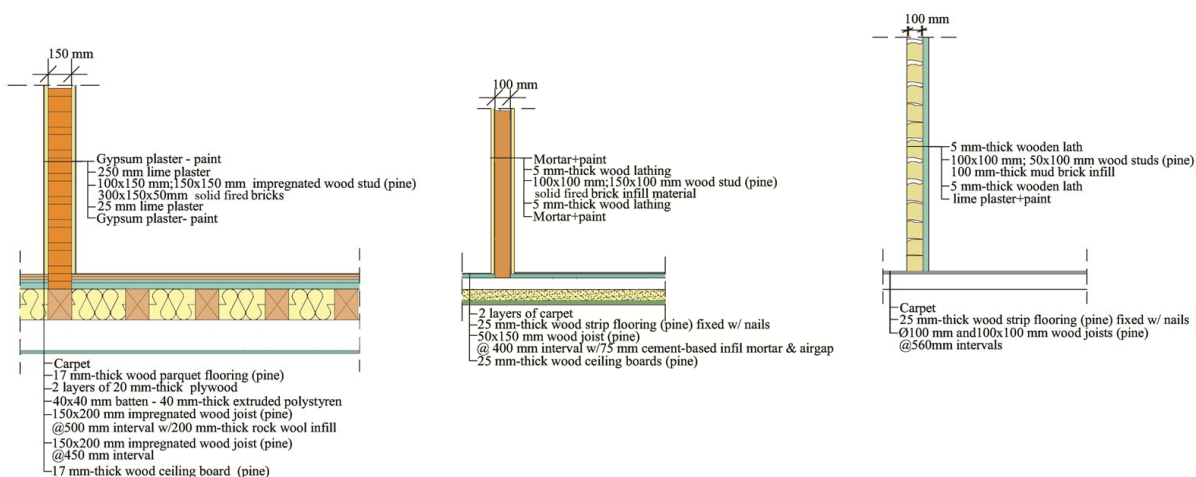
The configuration of existing walls and floors and definition of each layer forming the Reconstructed-Wall & Floor 1 (at the left); Semi-Repaired-Wall & Floor 2/3(at the middle); Original-Wall & Floor 4 (at the right).
